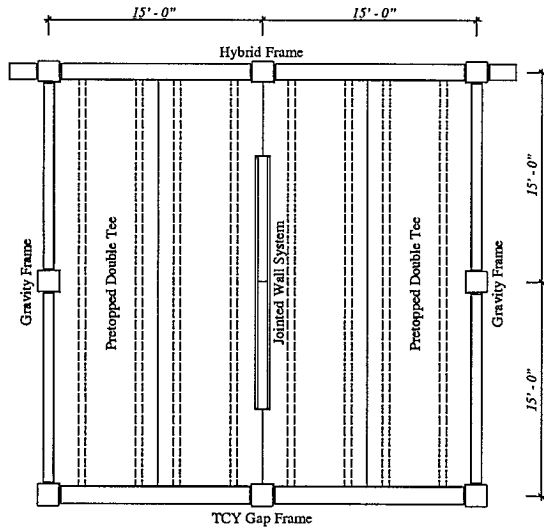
Floor plan of the test building at Levels 1 to 3.
